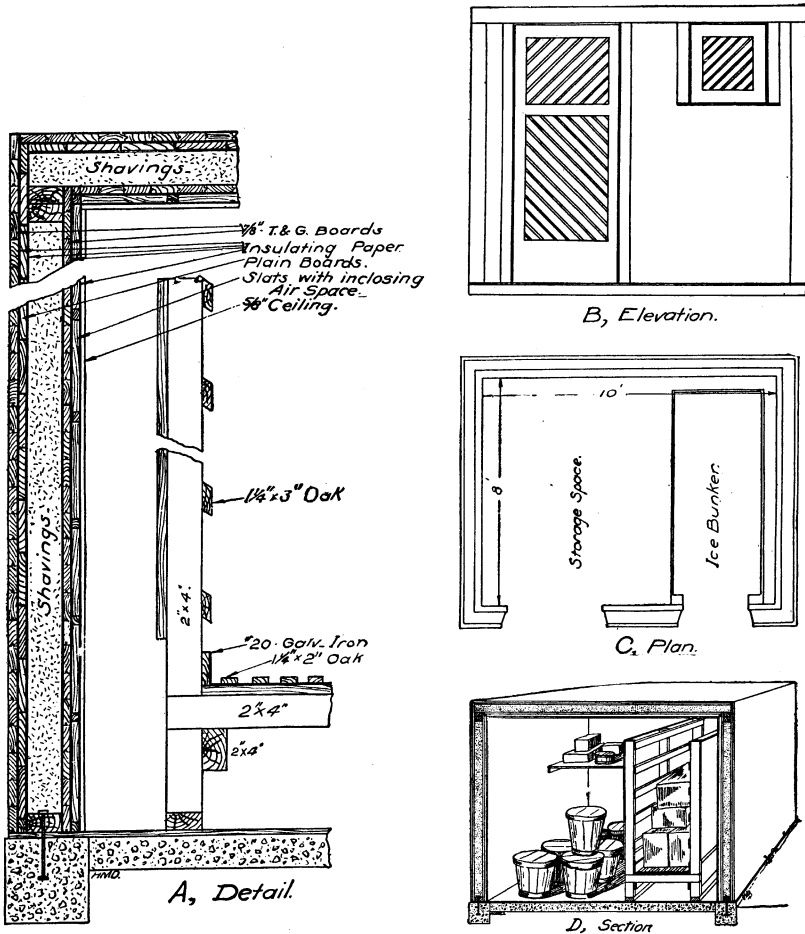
Diagrams showing cross section and details of construction of a farm refrigerator: A, Detail of wall construction and ice bunker; B, front elevation; C, floor plan; D, sectional view.
